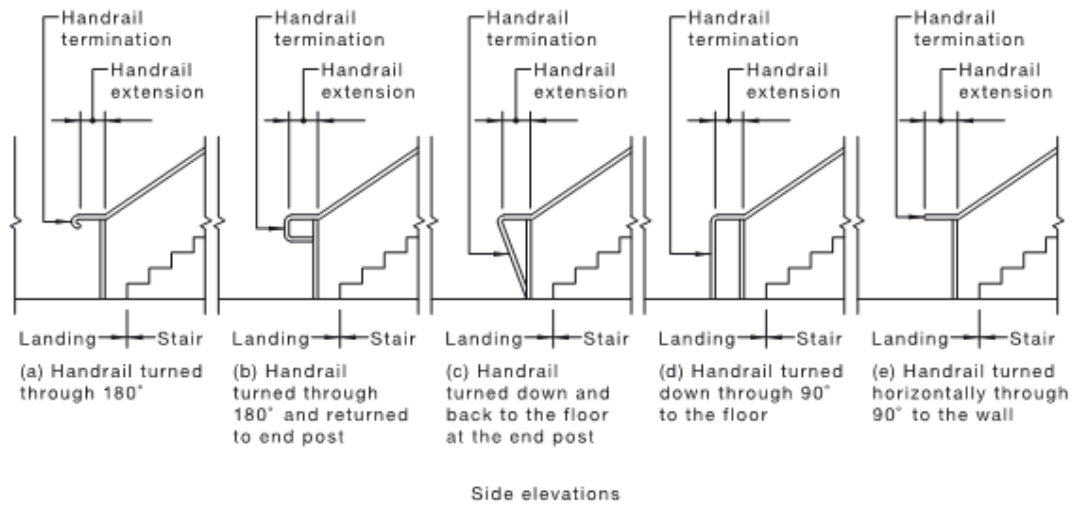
(C) STAIR HANDRAILS—HANDRAIL TERMINATIONS
